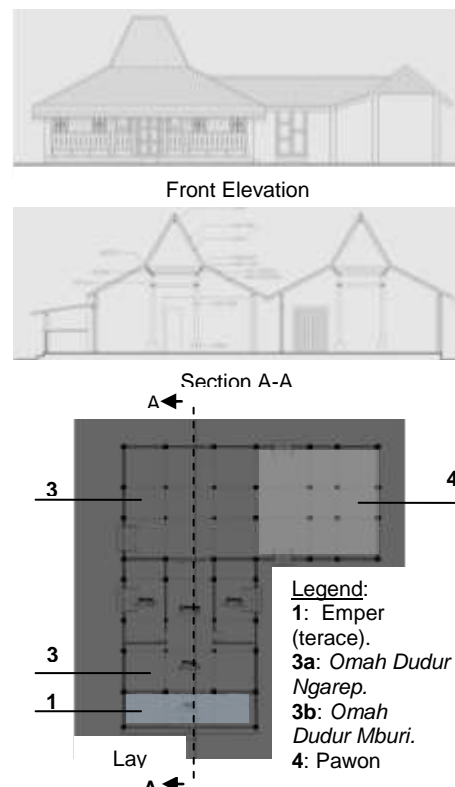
Lay Out, Section and Elevation Of Omah Dudur Loro
